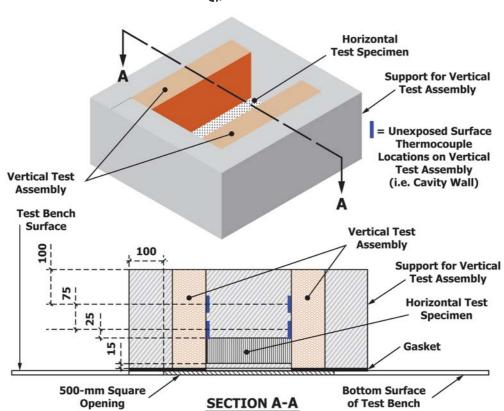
Horizontal Test Specimen in Vertical Test Assembly and Unexposed Surface Thermocouple Locations
